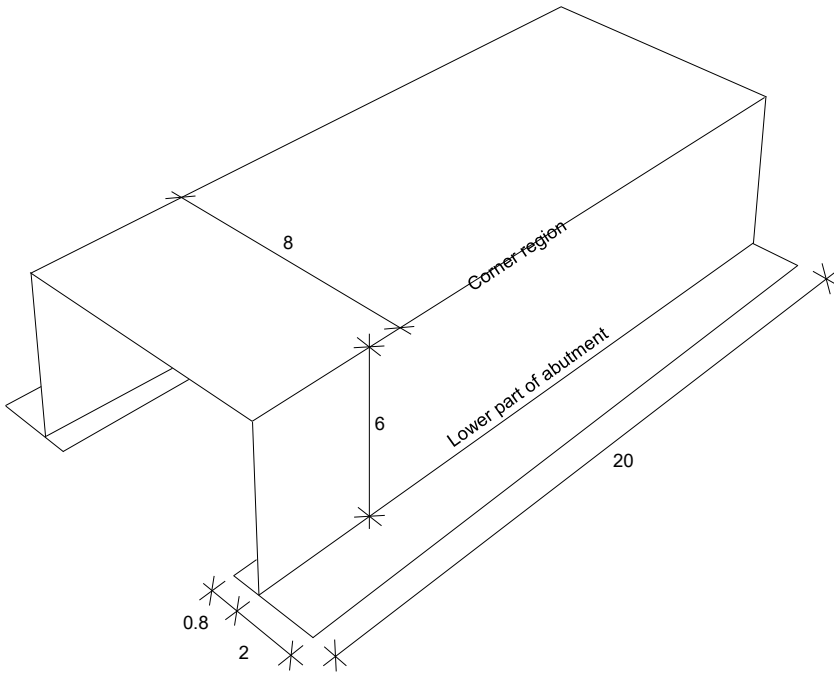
Structural model of bridge used in analyses of cracking. Dimensions in m.
